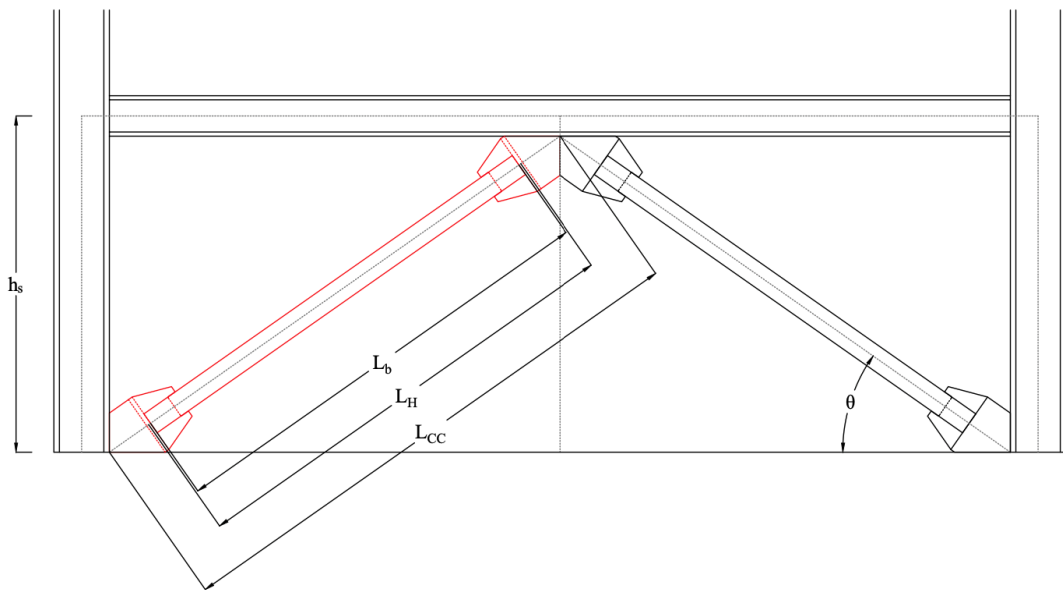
Schematic drawing of the inverted V-bracing frame with SHG connections
